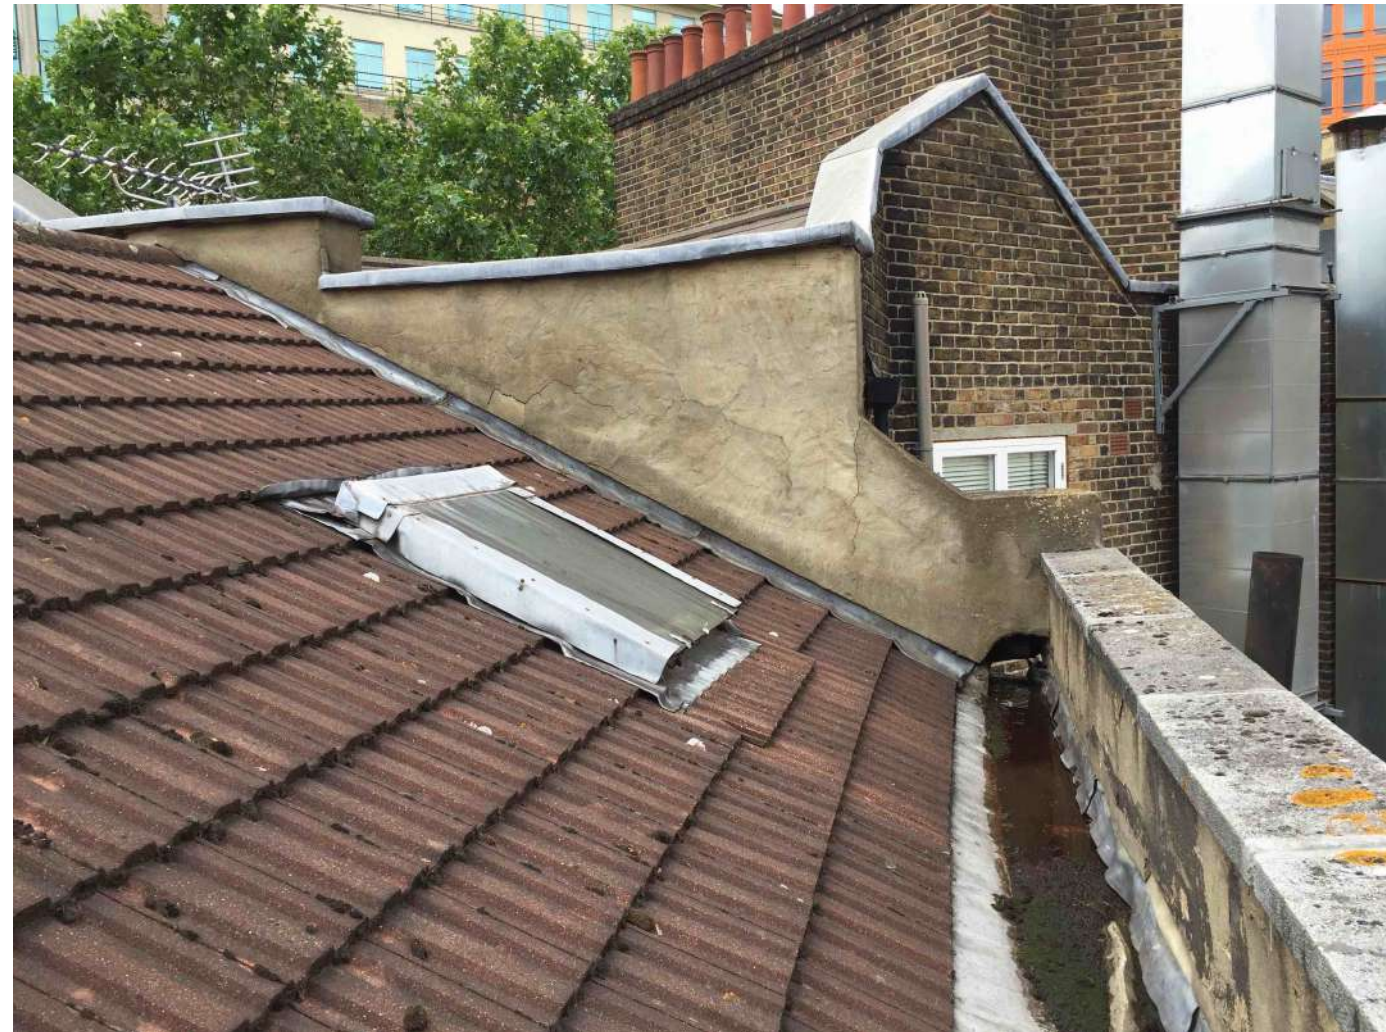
View looking north from Roof of No. 82 to party wall between Nos. 80 and 190 Shaftsbury Avenue (rear side) showing the interlocking roof tiles to the roof of the property.
